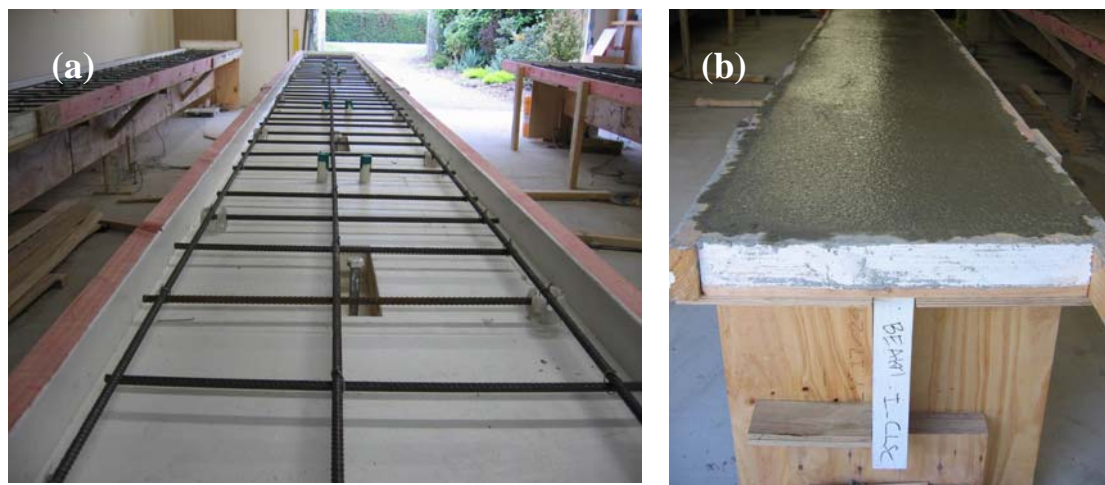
(a) Reinforcement laid; (b) after concrete pour
